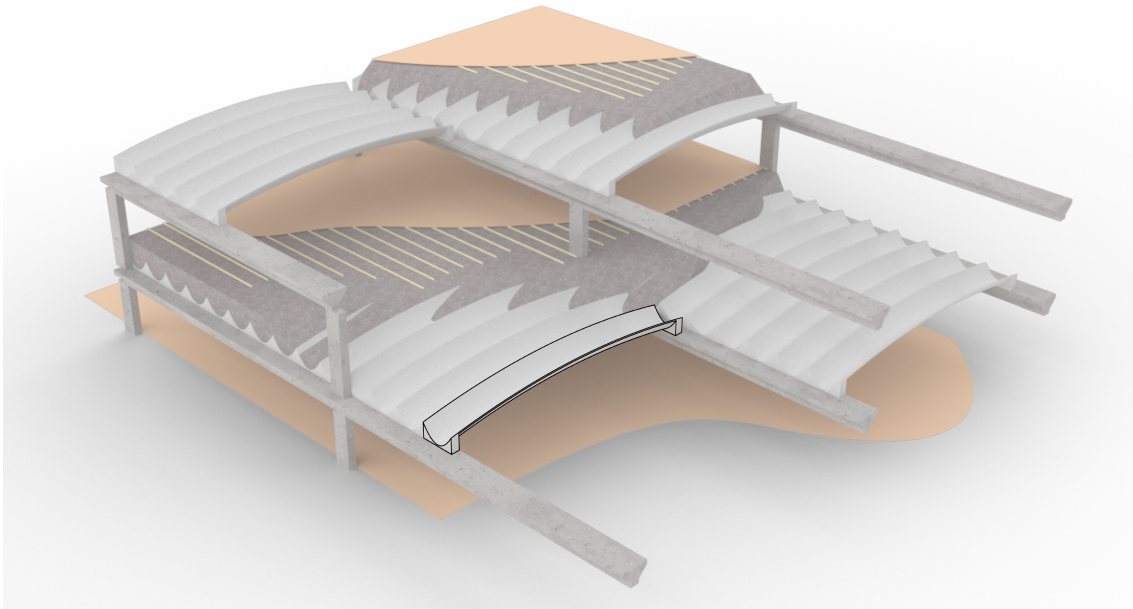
Thought slab system, where a slab element is highlighted with black. The system is filled to achieve a level top, on which interior floor is placed.
